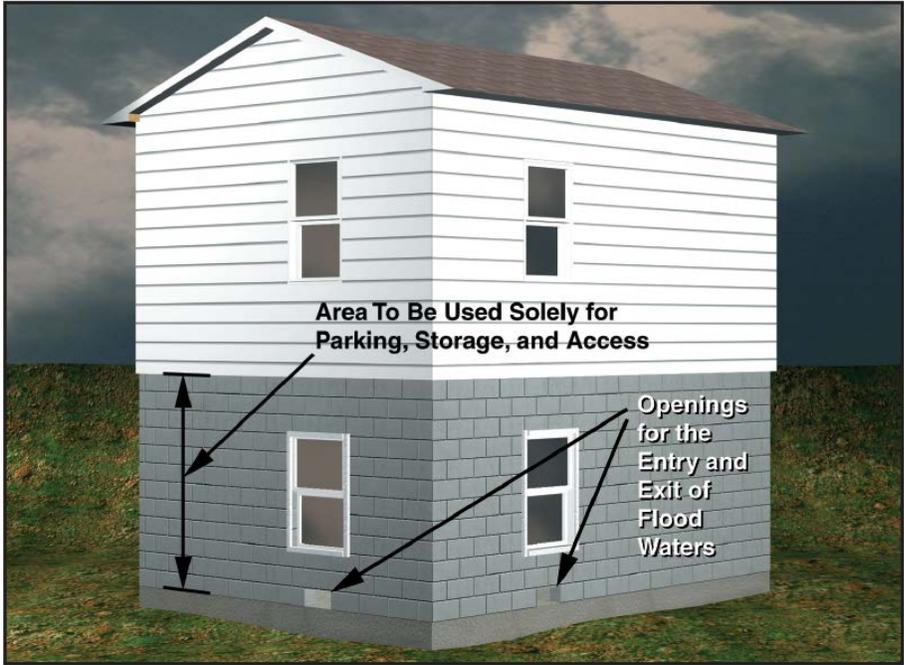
Building was raised and foundation constructed to provide an enclosed area that can be used only for parking, storage and building access
